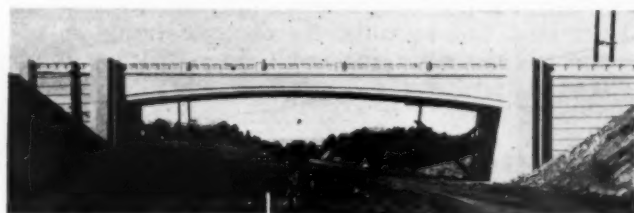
Typical Rigid Frame Overhead, Rigid Frame Type
